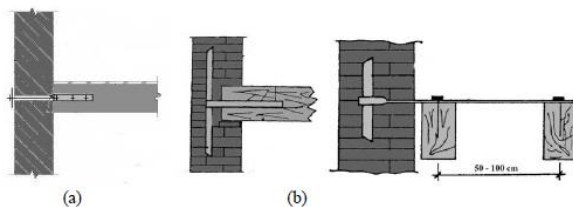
Strengthening the connections between walls and floors - a) by introducing apparent anchors; b) by inserting the anchors in the thickness of the walls [1, 97]
